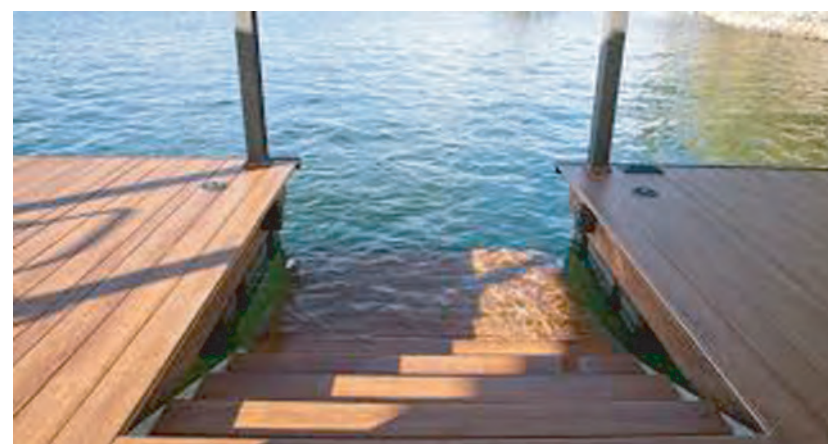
IMAGE: WATER ACCESSIBLE STEPPED JETTIES WITH COMPOSITE TIMBER DECKING
